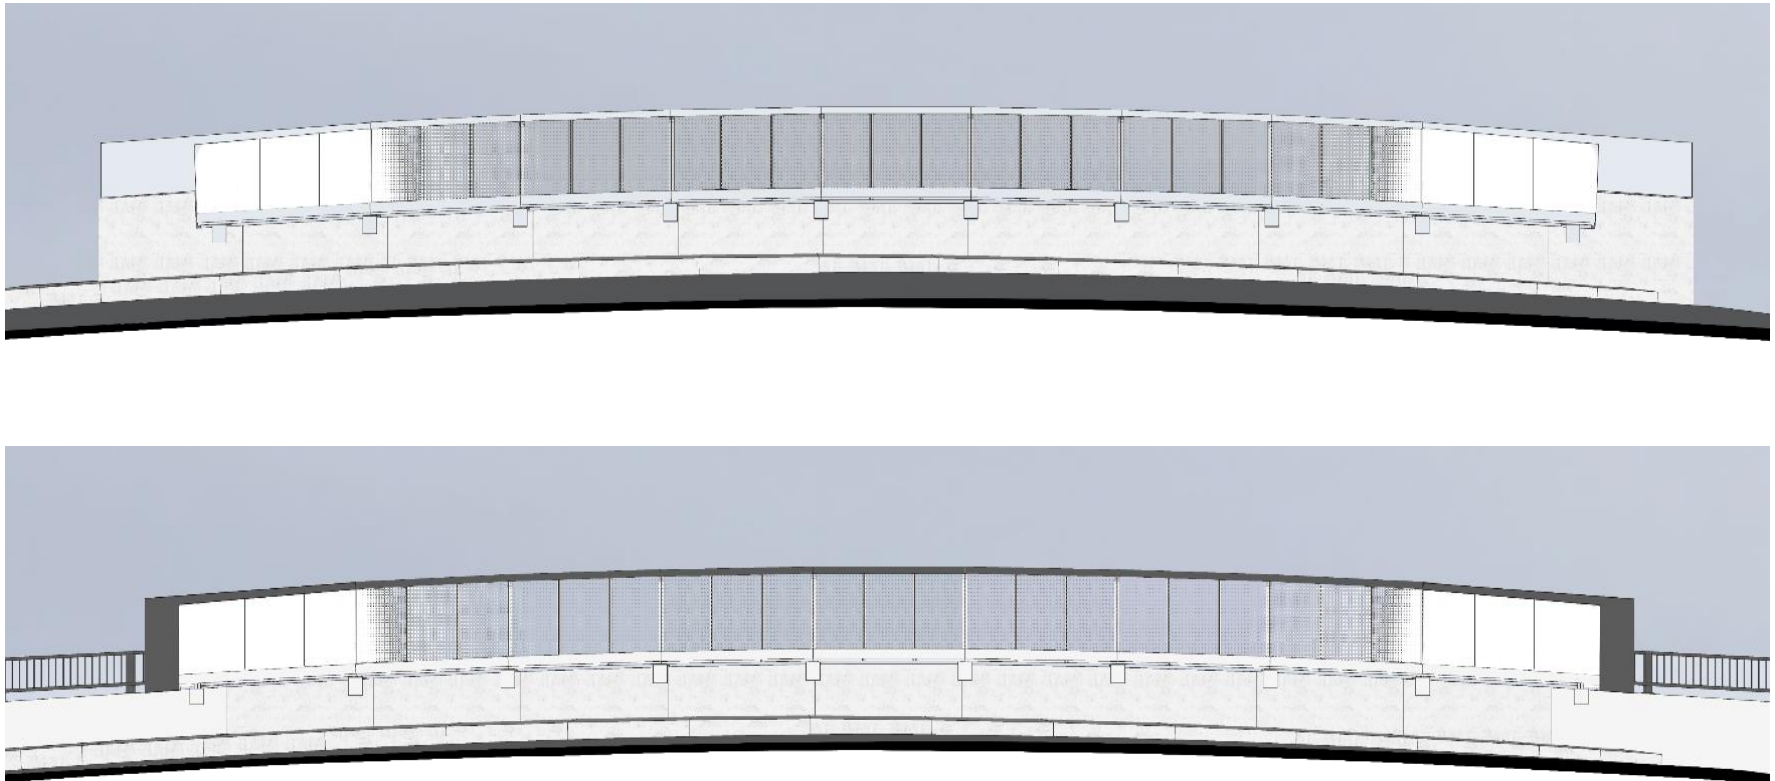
Bridge Barrier Design Option Example (Glass Back View)
